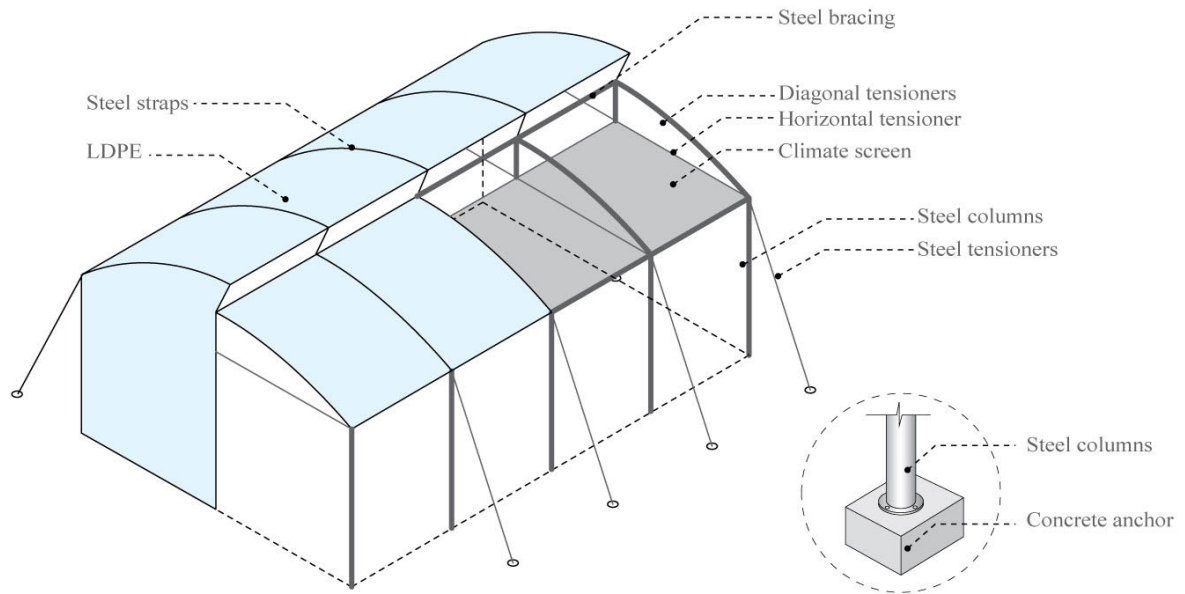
Tropical vault greenhouse with description of structure and envelope elements. Adapted from (NOVACERO, n.d.)
